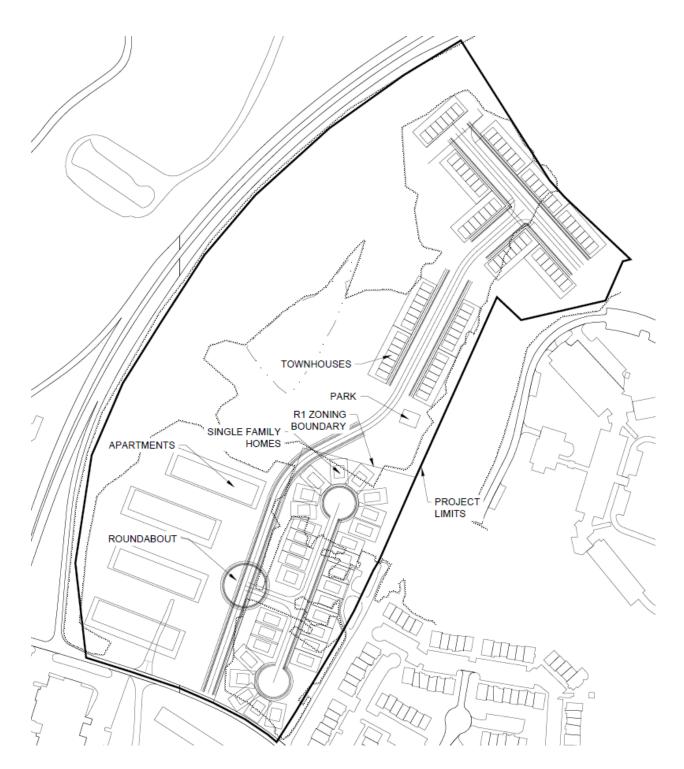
Preliminary Site Plan 35% Completion (October 16, 2023)
